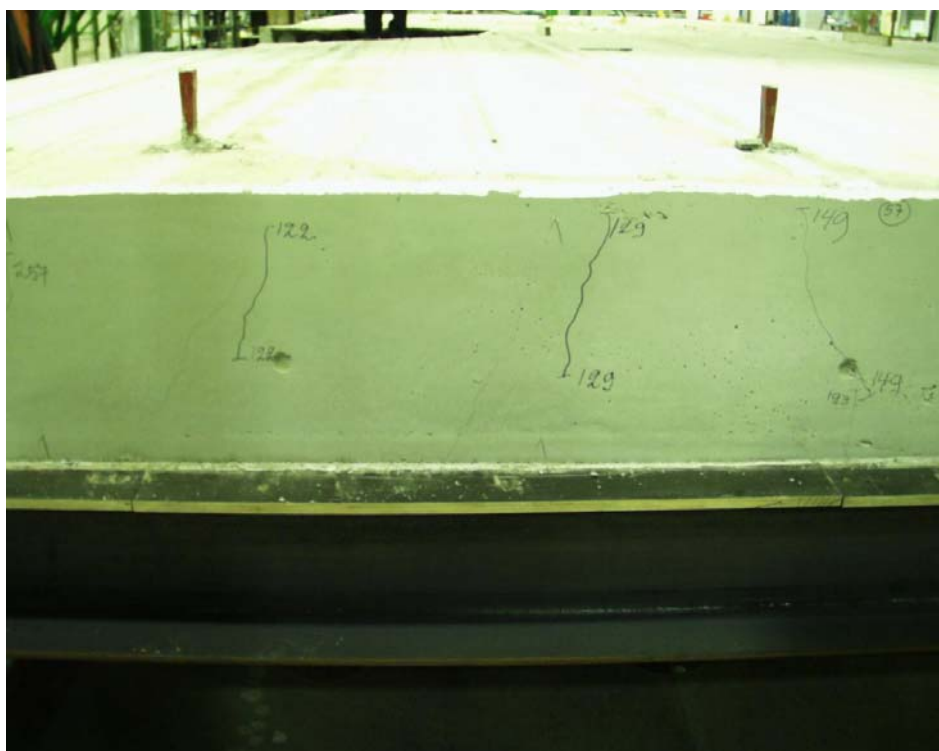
Slab 11 after test. Cracks in tie beam.
